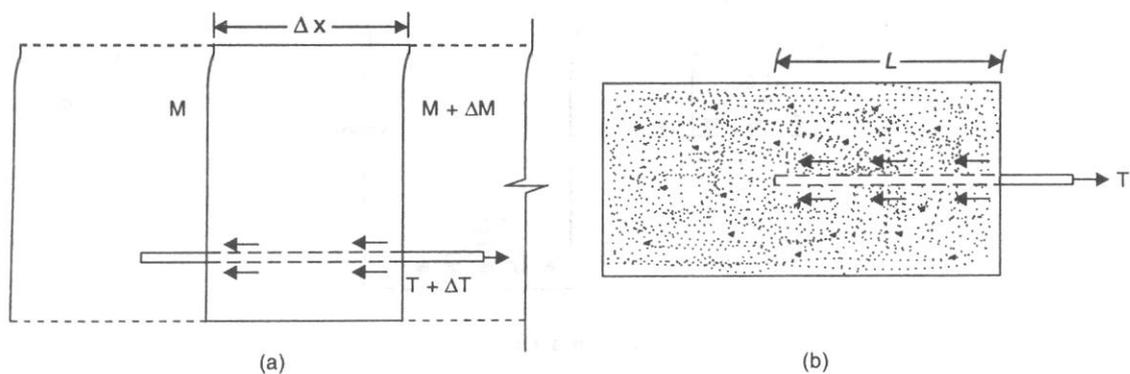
Bond stresses: (a) Local (flexural); (b) Anchorage (average).
